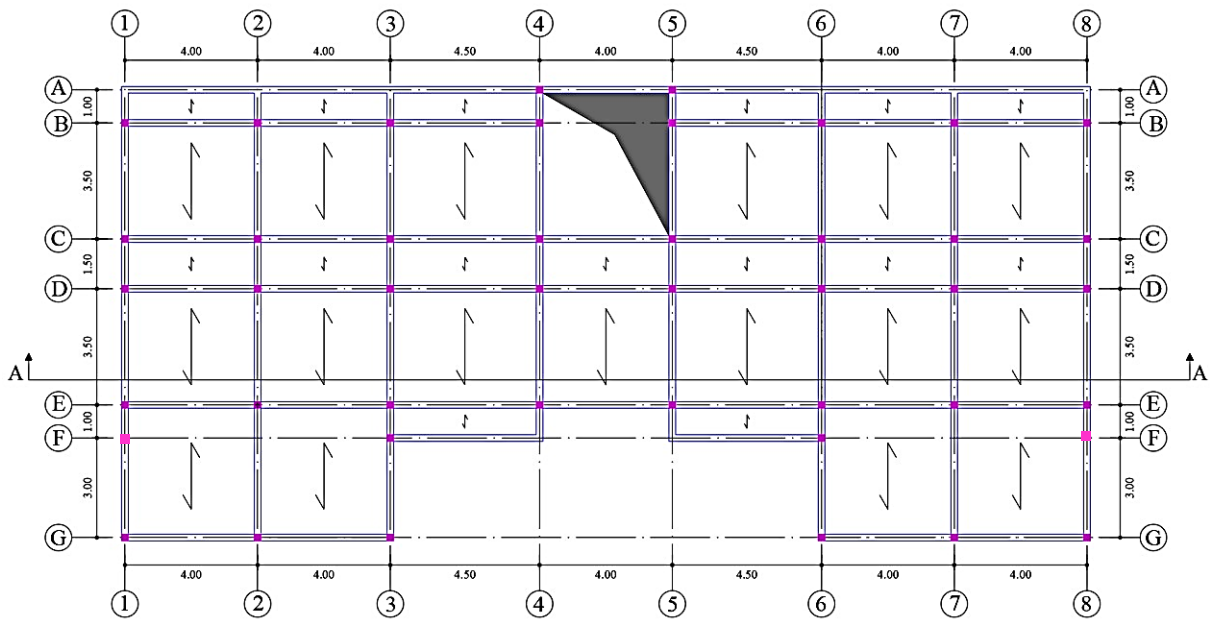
slab Formwork plan of case study with RC Slab with embedded elements
